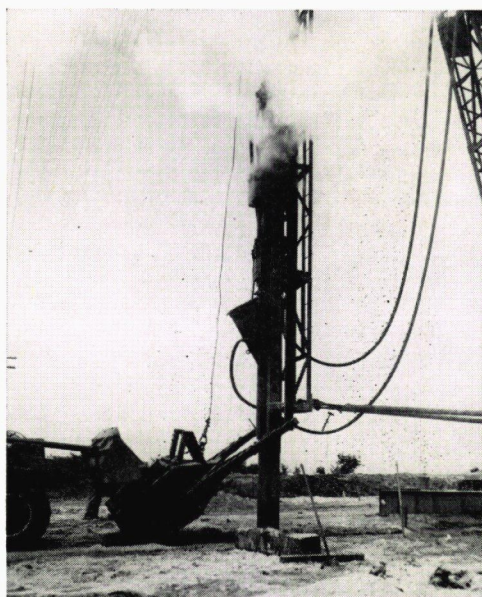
Driving of 16-inch diameter sand drain mandrel to 55 feet below lake level.
